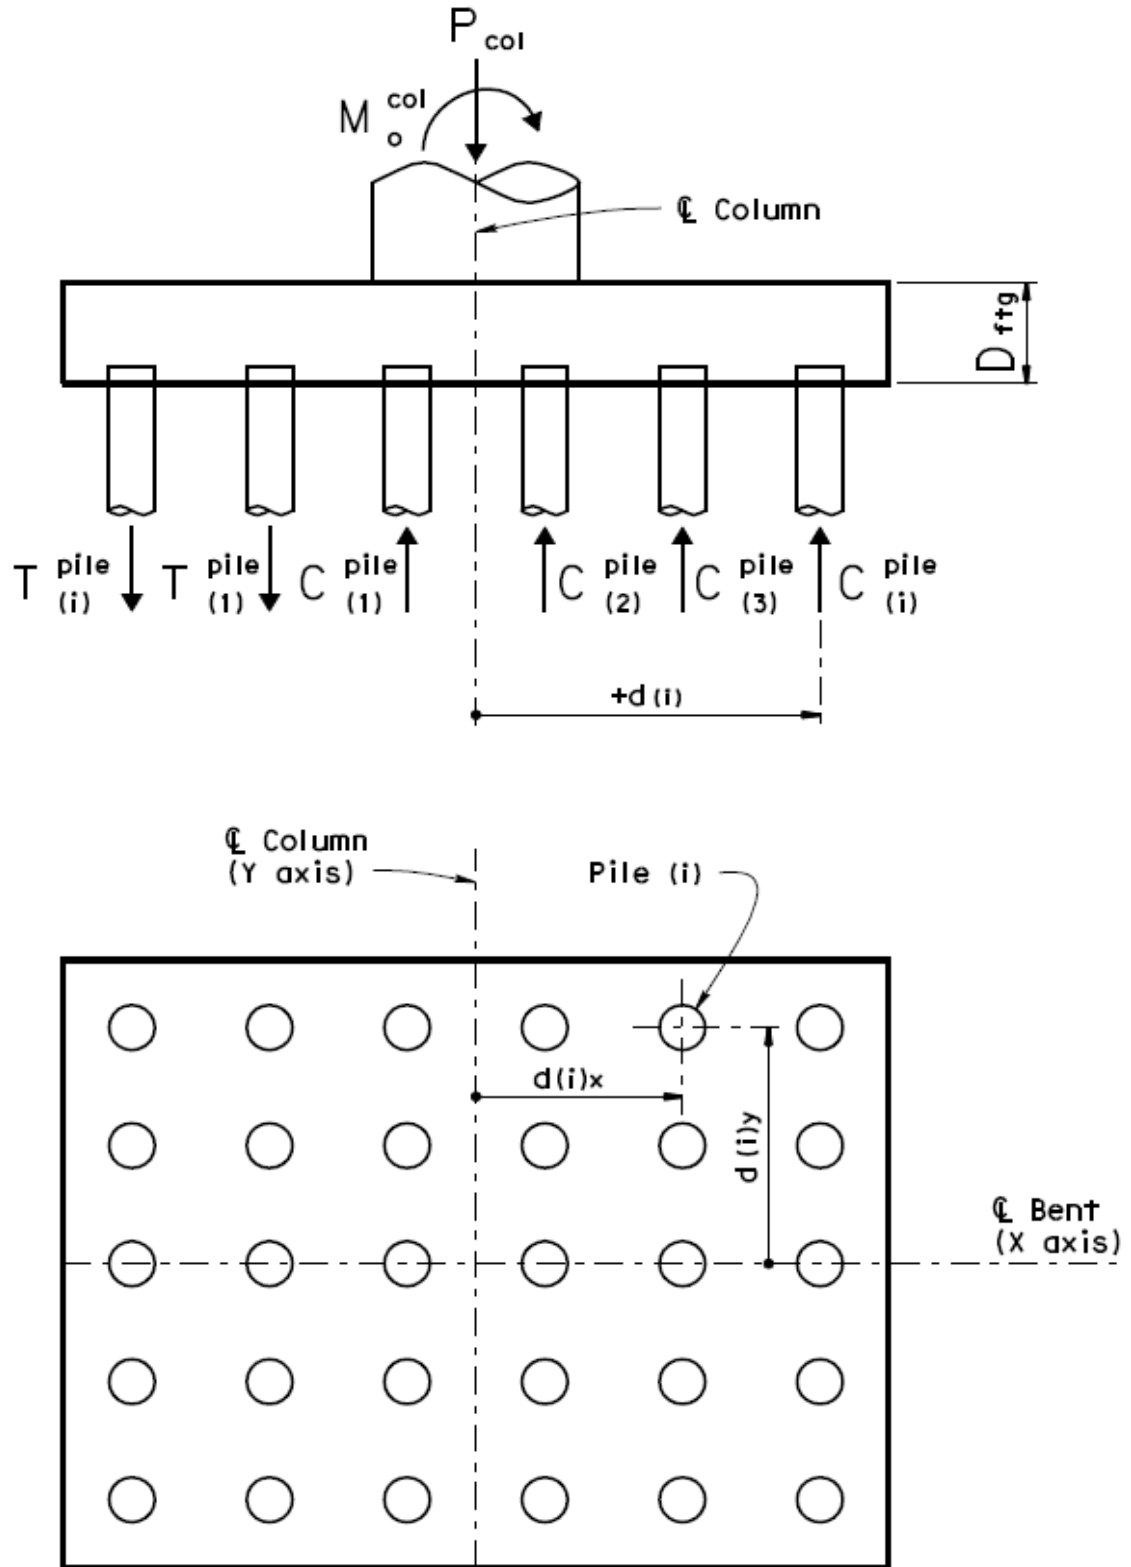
Simplified Pile Model for Foundations in Competent Soil
